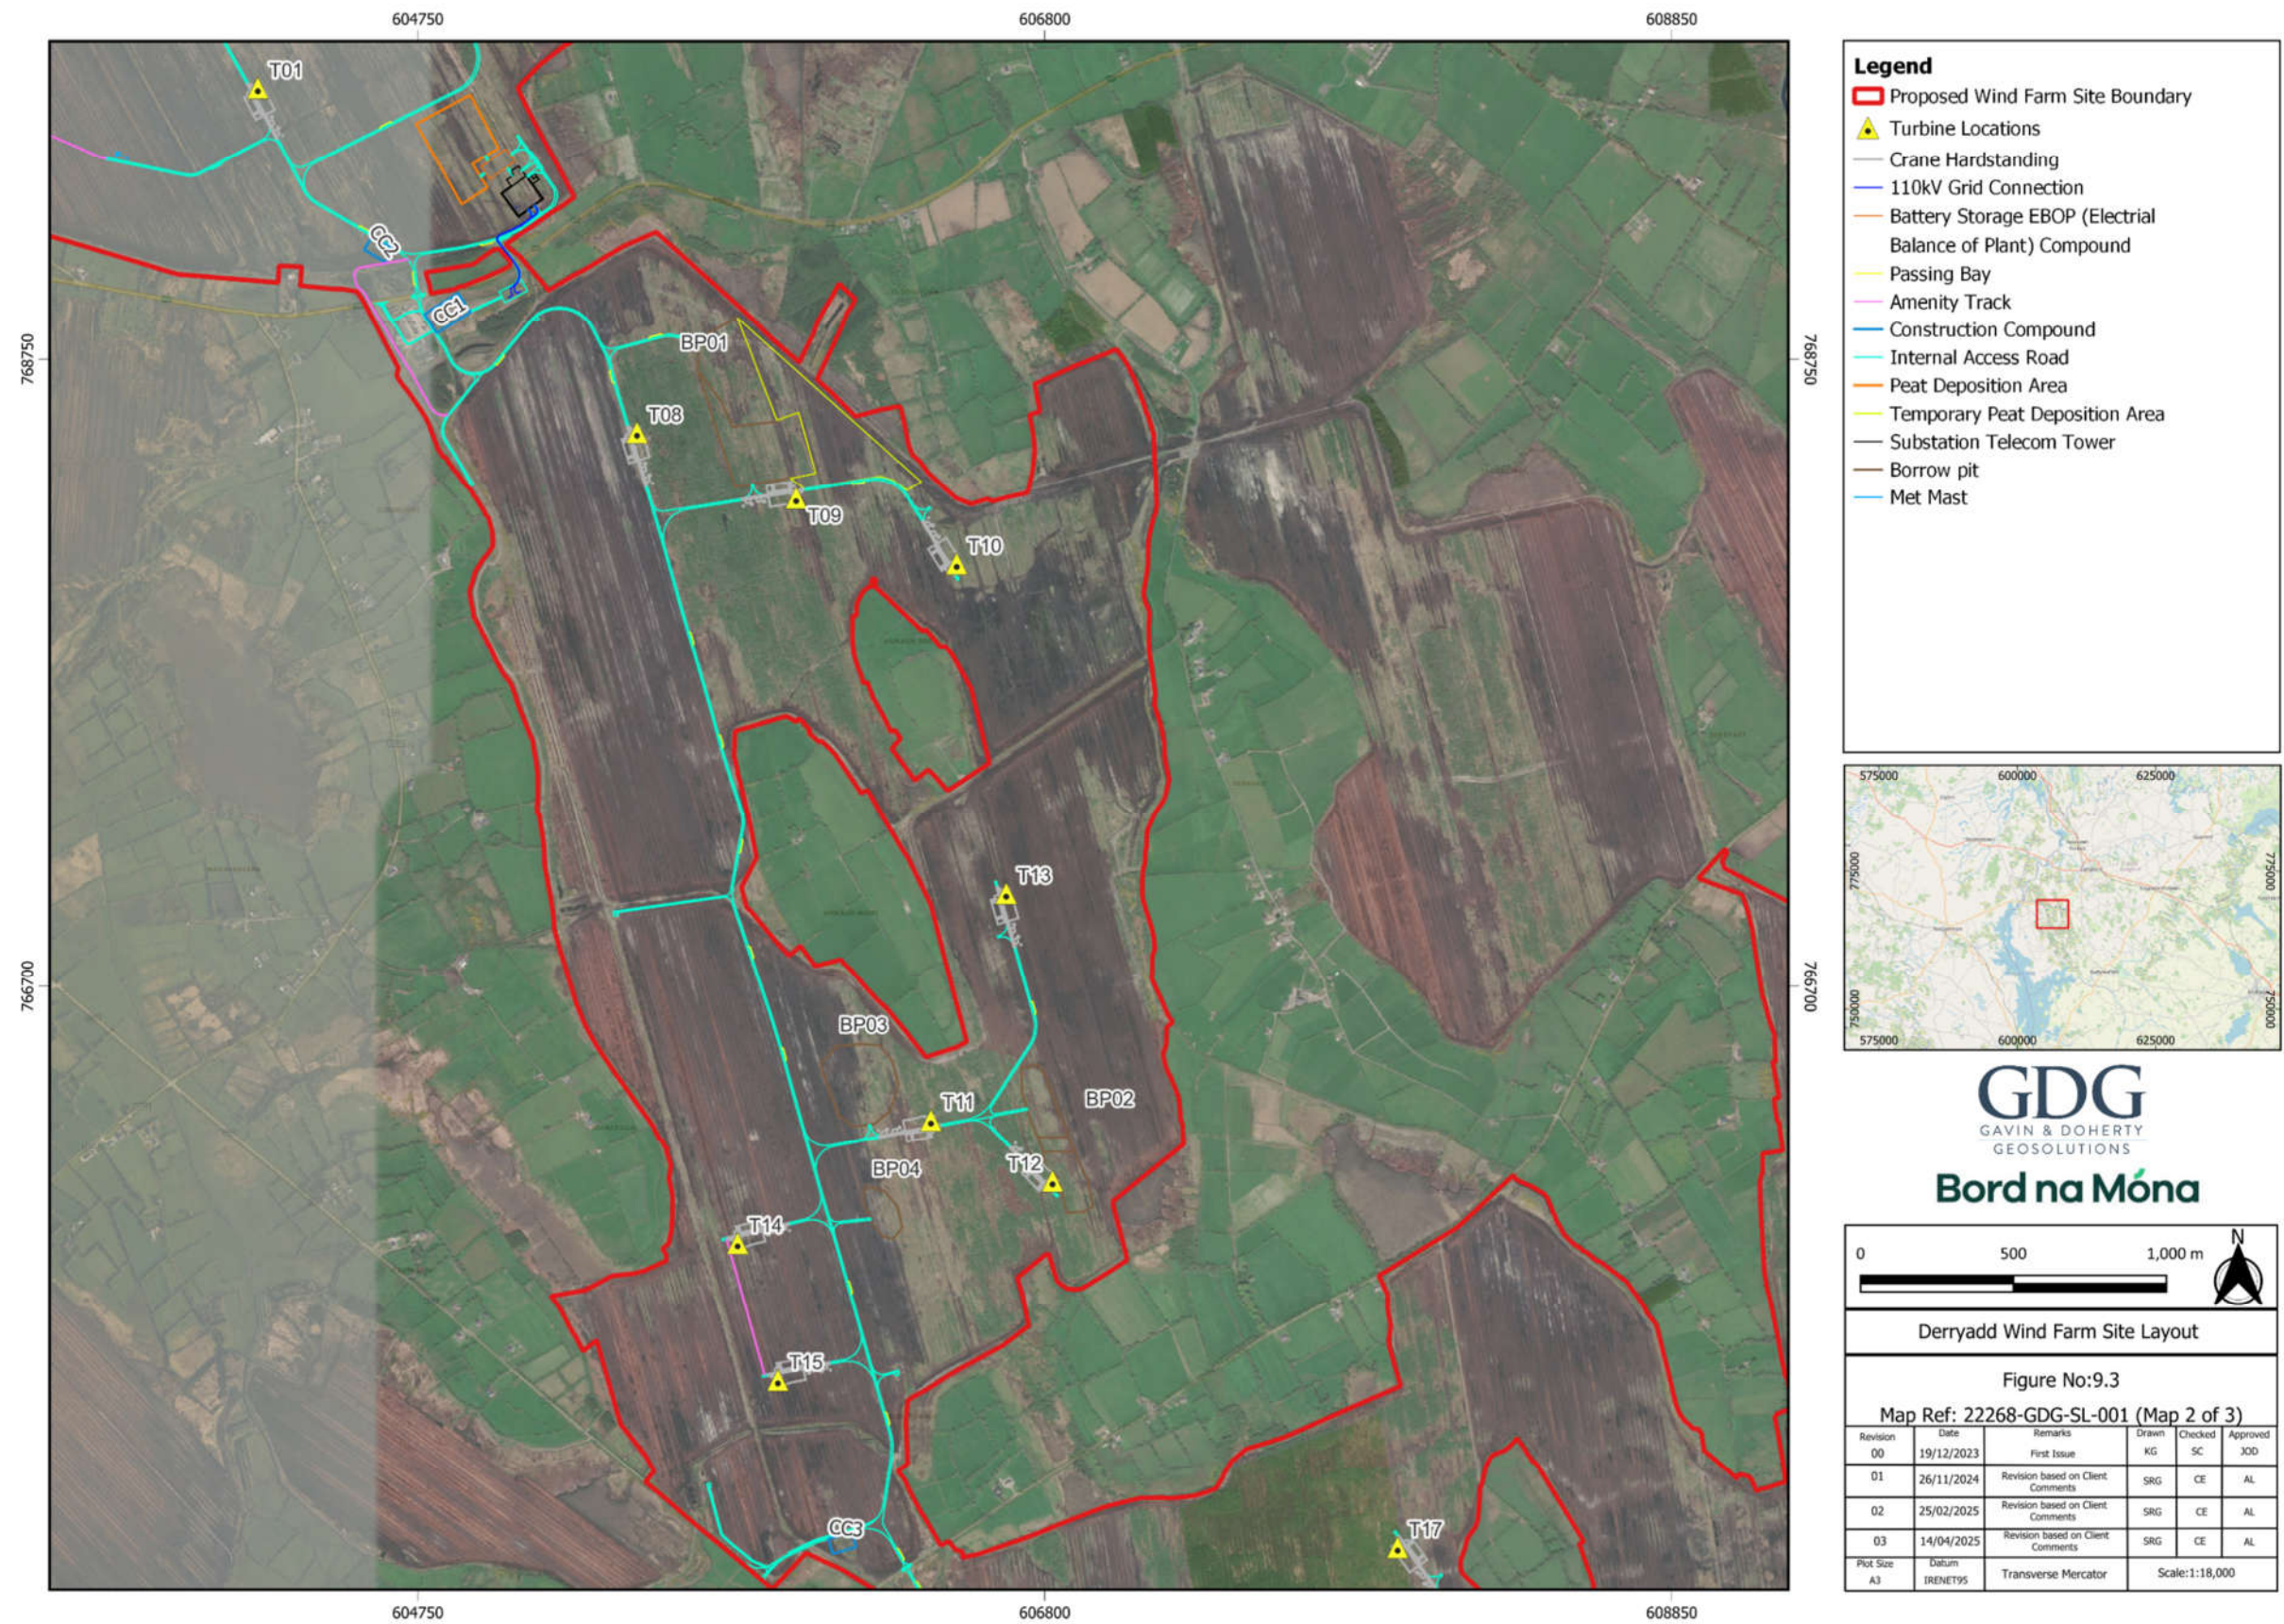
Derryadd Wind farm site layout (Map 2 of 3)
